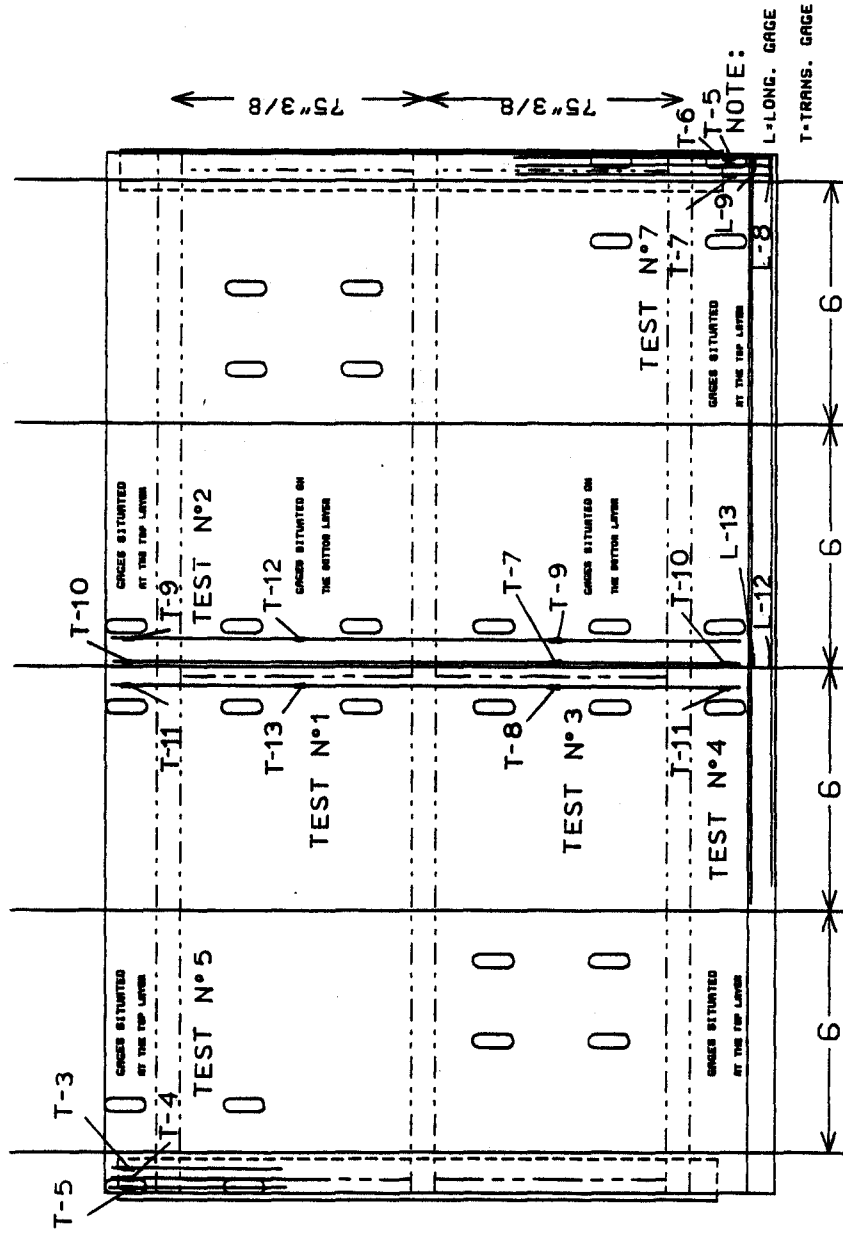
Reinforcement Steel Strain Gage Locations (Second Bridge)
